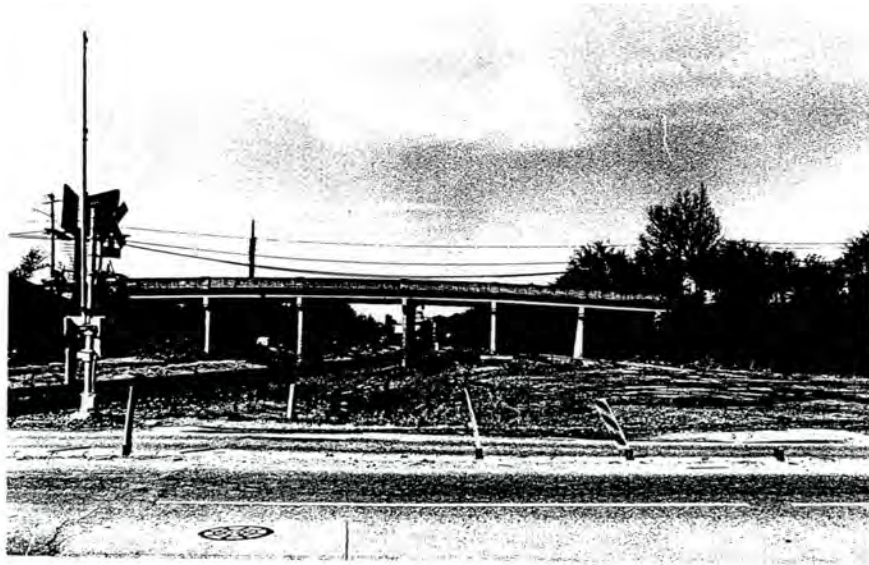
Looking North Towards Bridge No. 266 From Corban Avenue.
